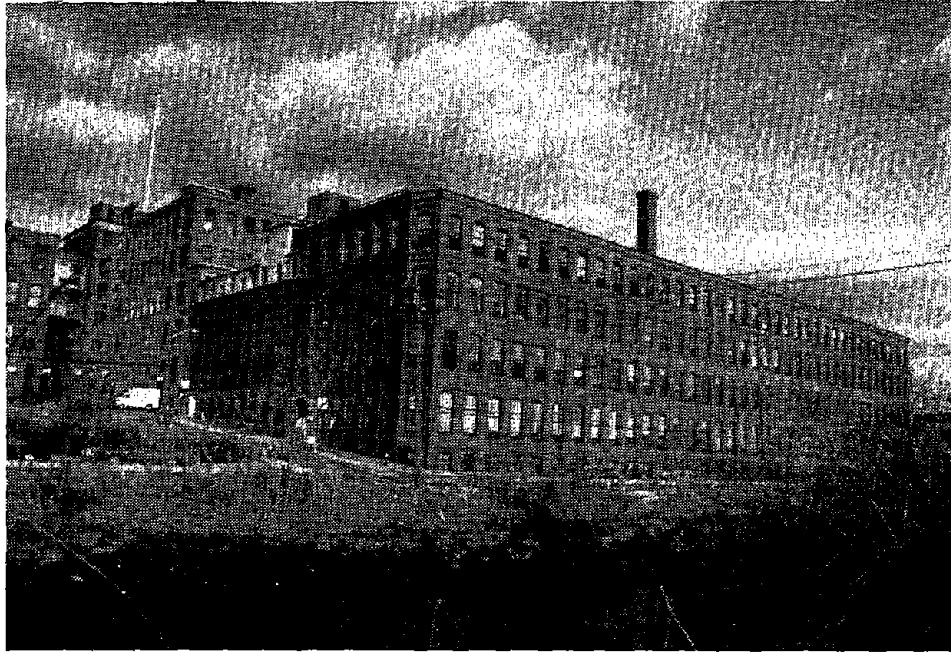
LARGE URM INDUSTRIAL BUILDING
